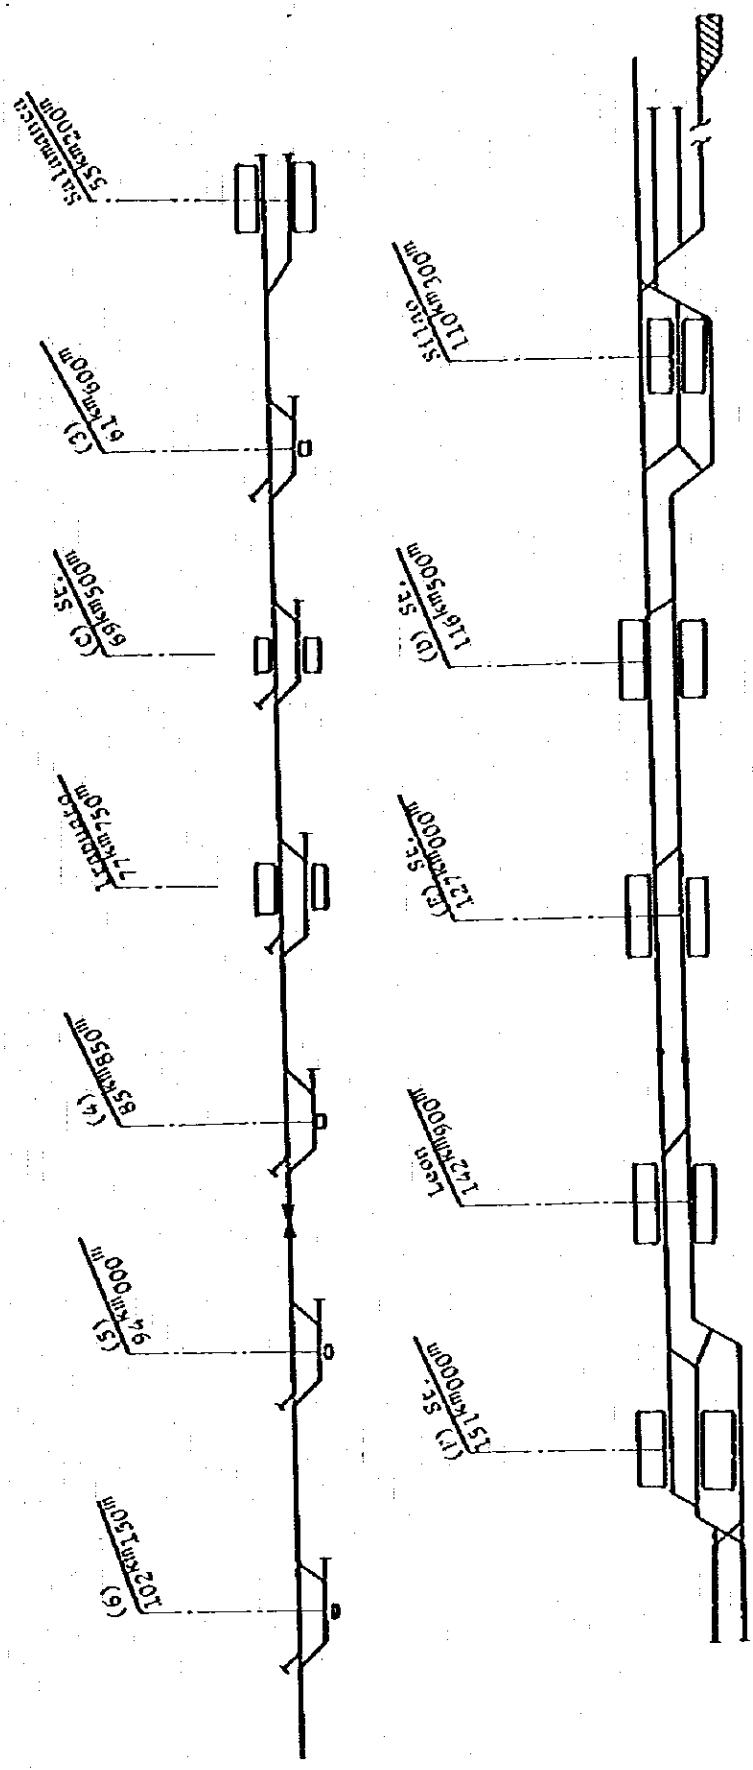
General Layout of Track (Case 1 and Case 2, Stage 1)
